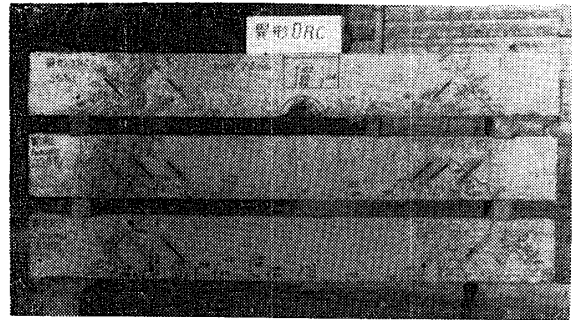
,b Right side crack of the deformed steel bar over reinforced concrete beams
